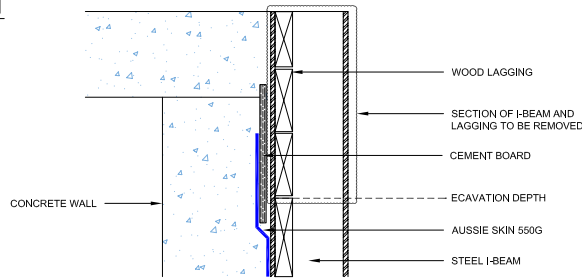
MID-LAGGED SOLDIER PILE DETAIL
